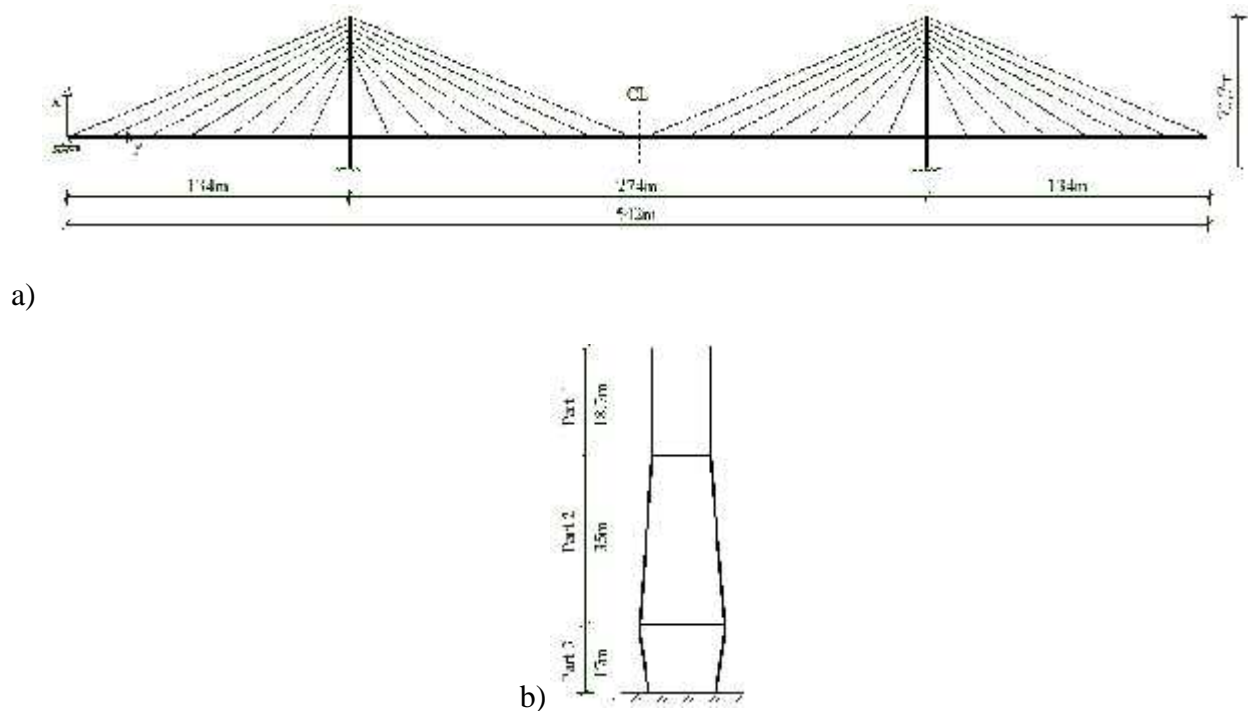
Details of the cable-stayed bridge model (a), and of the towers (b).
